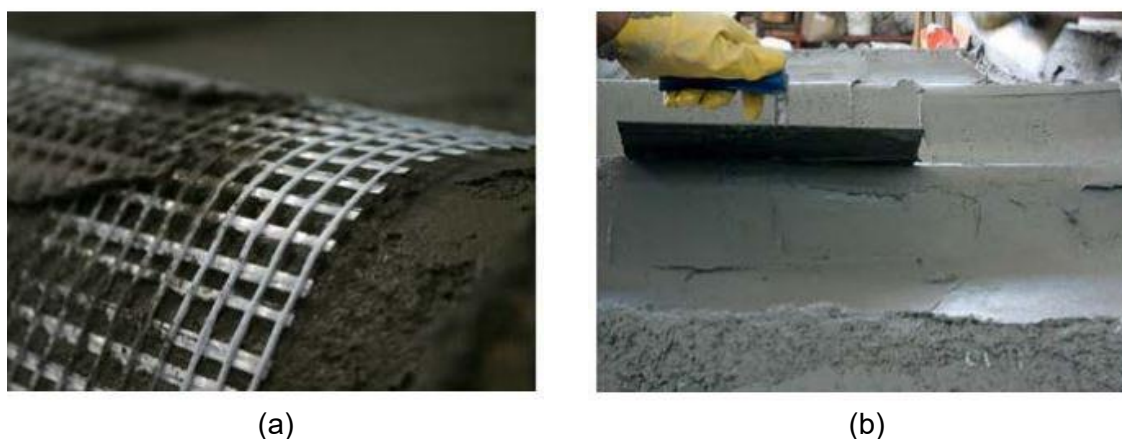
Reinforcement of the Rottachsteg in Kempten; a) placing the prefabricated fibre mat; b) Applying the concrete in a lamination process © Dirk Jesse and Harald Michler
